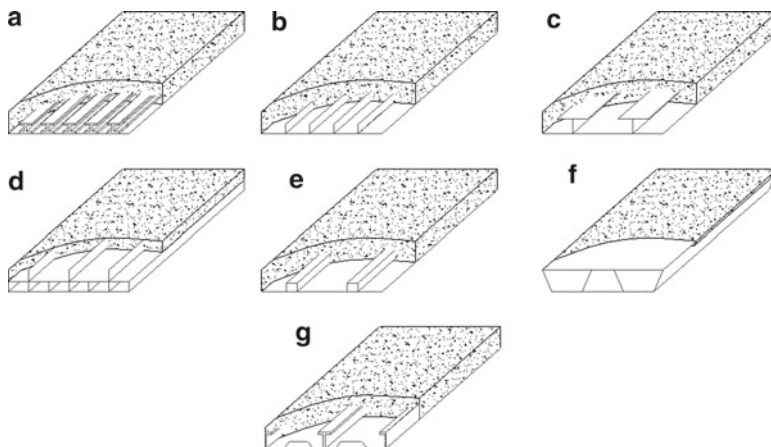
Concrete deck systems reinforced with stiffened or corrugated SIP form: (a) I-beam; (b) vertical web; (c) T-upstand; (d) cavity section; (e) tubular stiffener; (f) bonded tubes; and (g) corrugated profile with or without studs
